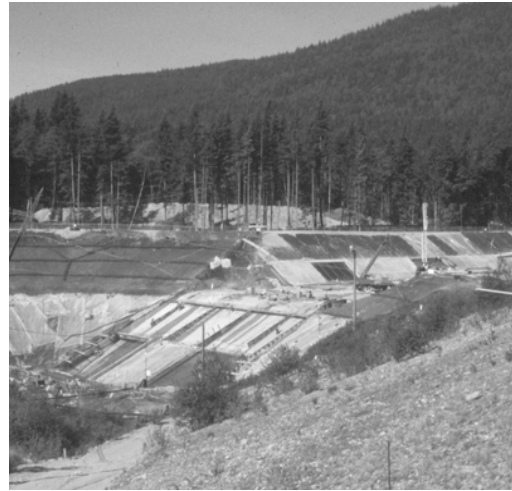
Critical application: construction of an underdrain for a dam spillway.
